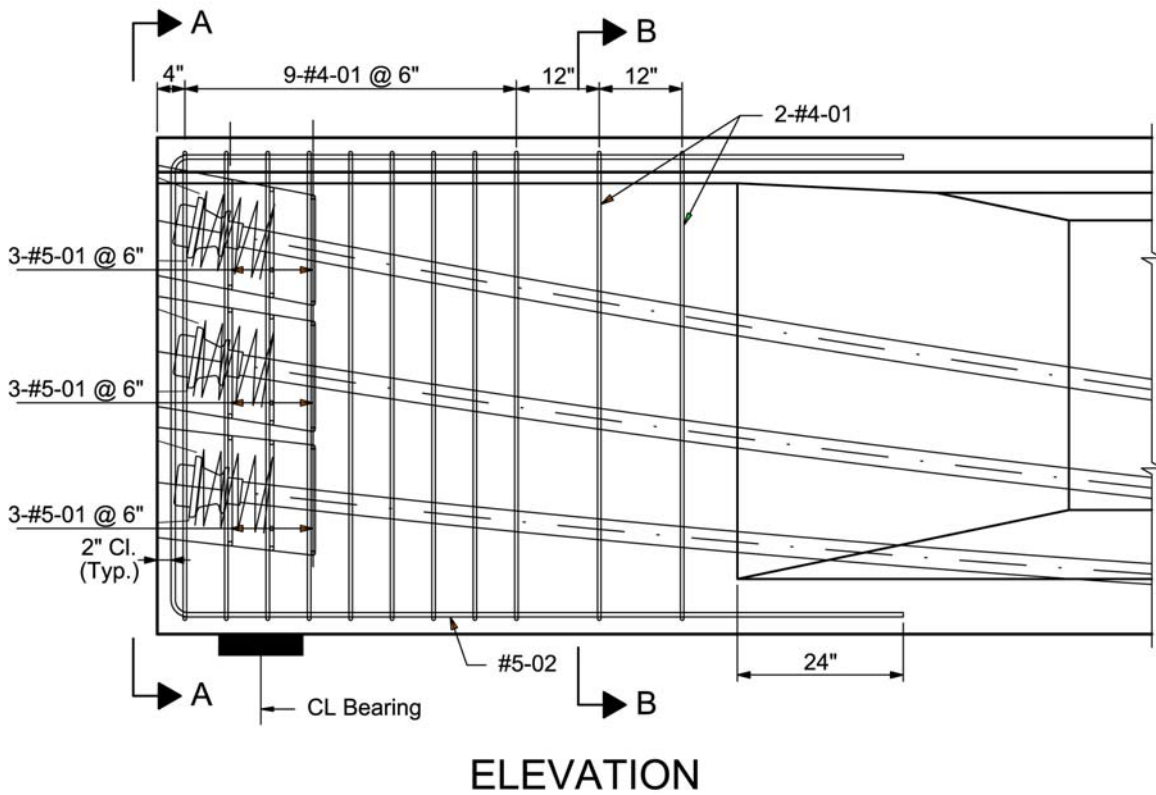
Strut and Tie Models for a Post-Tensioned Girder
